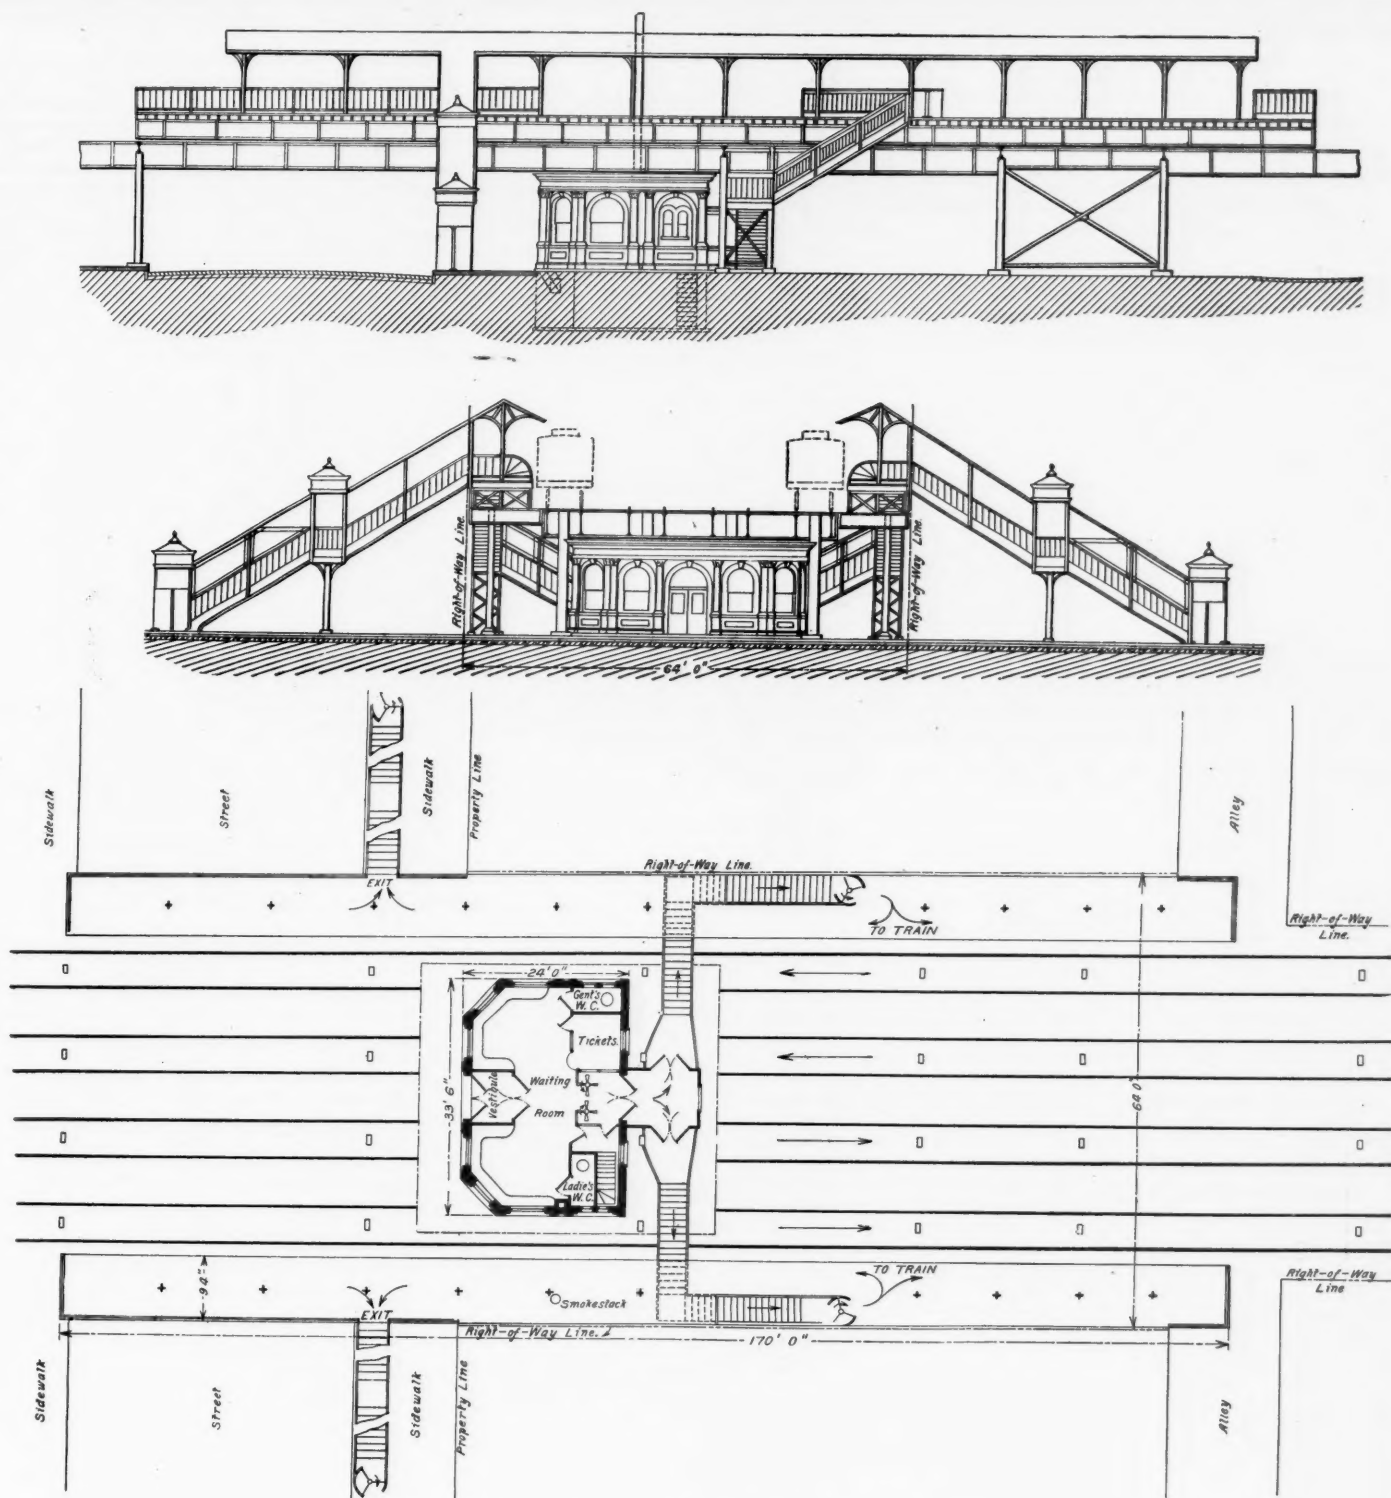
General Plan and Elevation of Exterior Platform Station.
